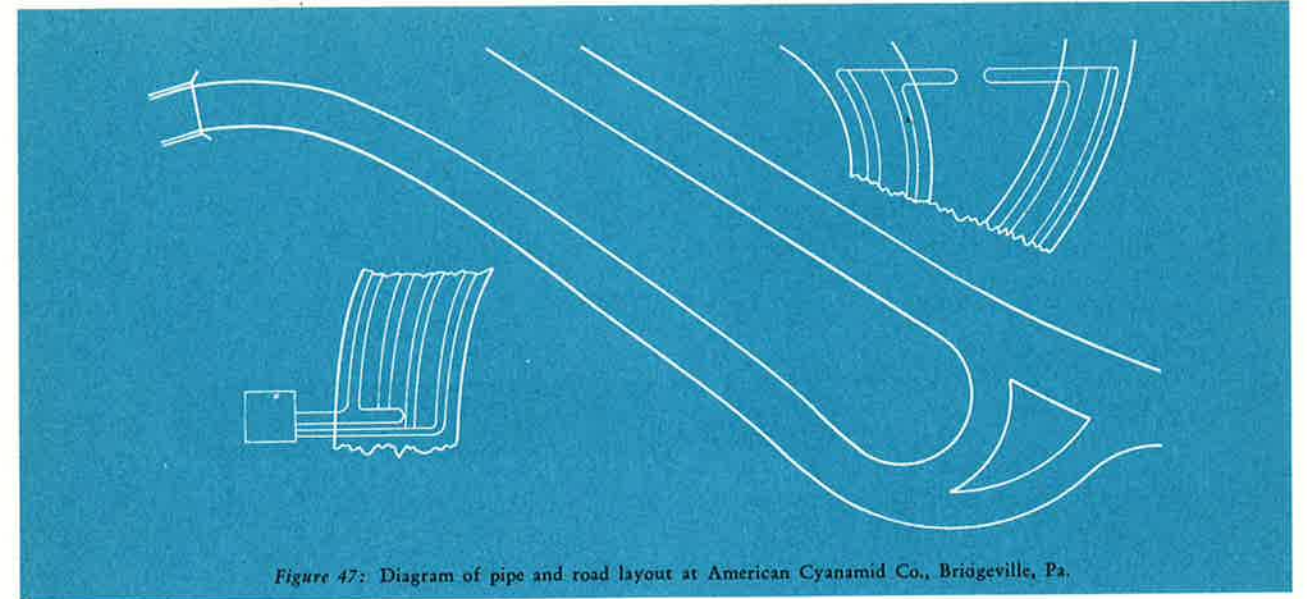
Diagram of pipe and road layout at American Cyanamid Co., Bridgeville, Pa.
